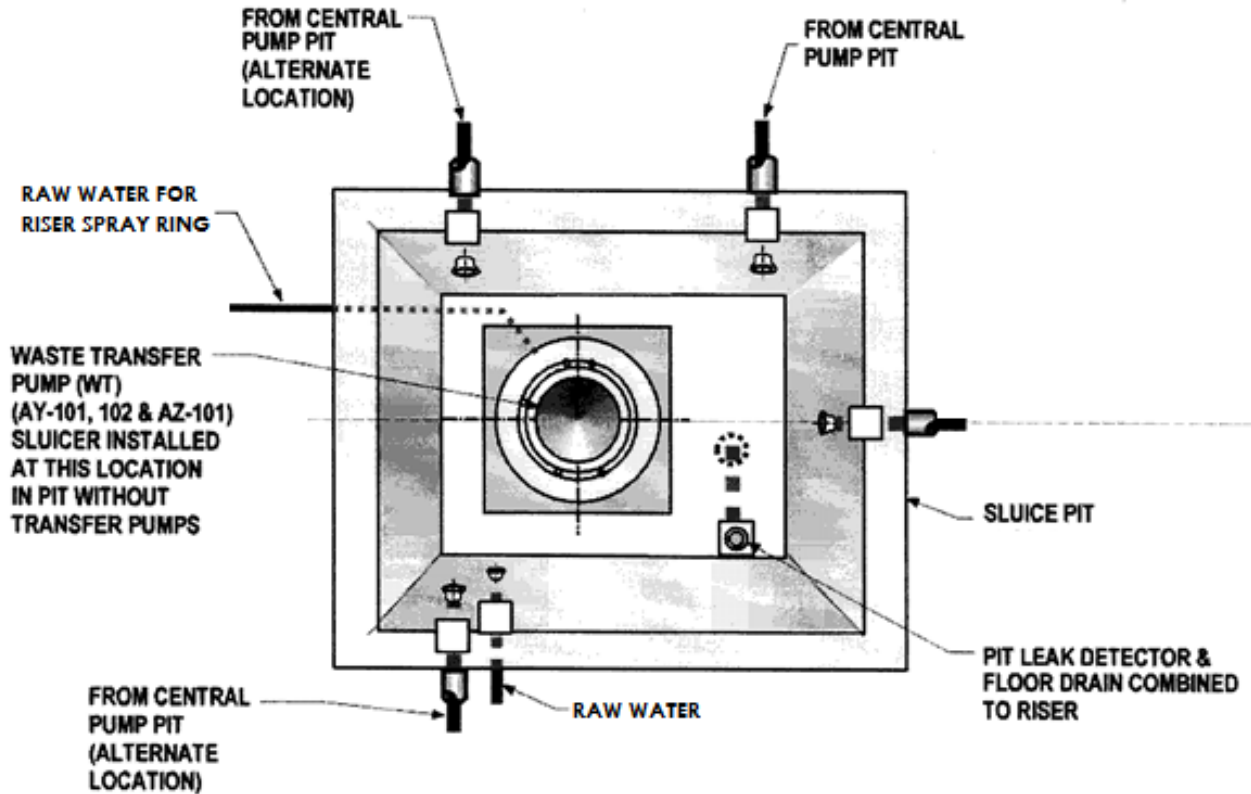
Sluice Pit Three-Dimensional Plan View (241-AY/241-AZ Tank Farms)
